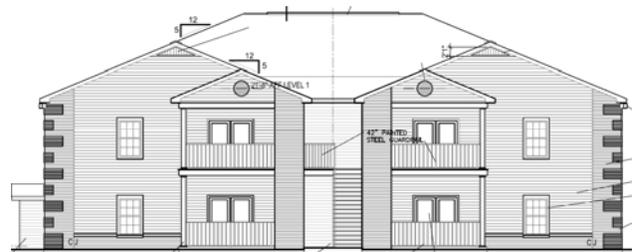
Front elevation of roof design with geometry/rainwater concentration issues
